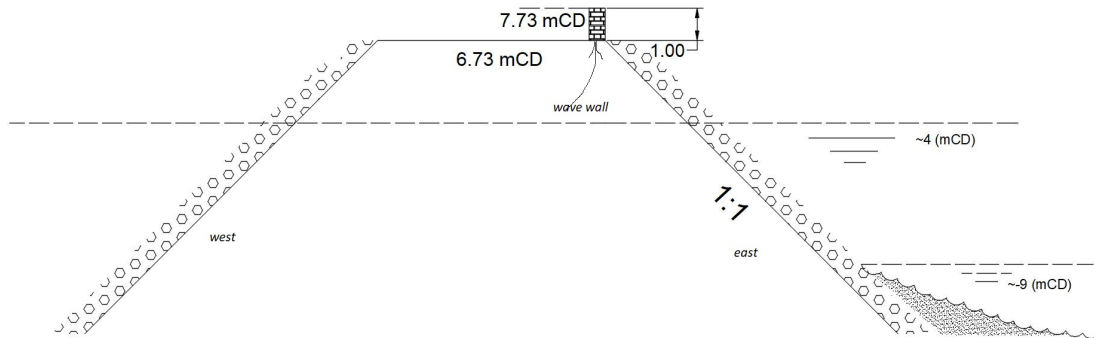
Cross section sketch of barrier, with present wave wall on crest.
